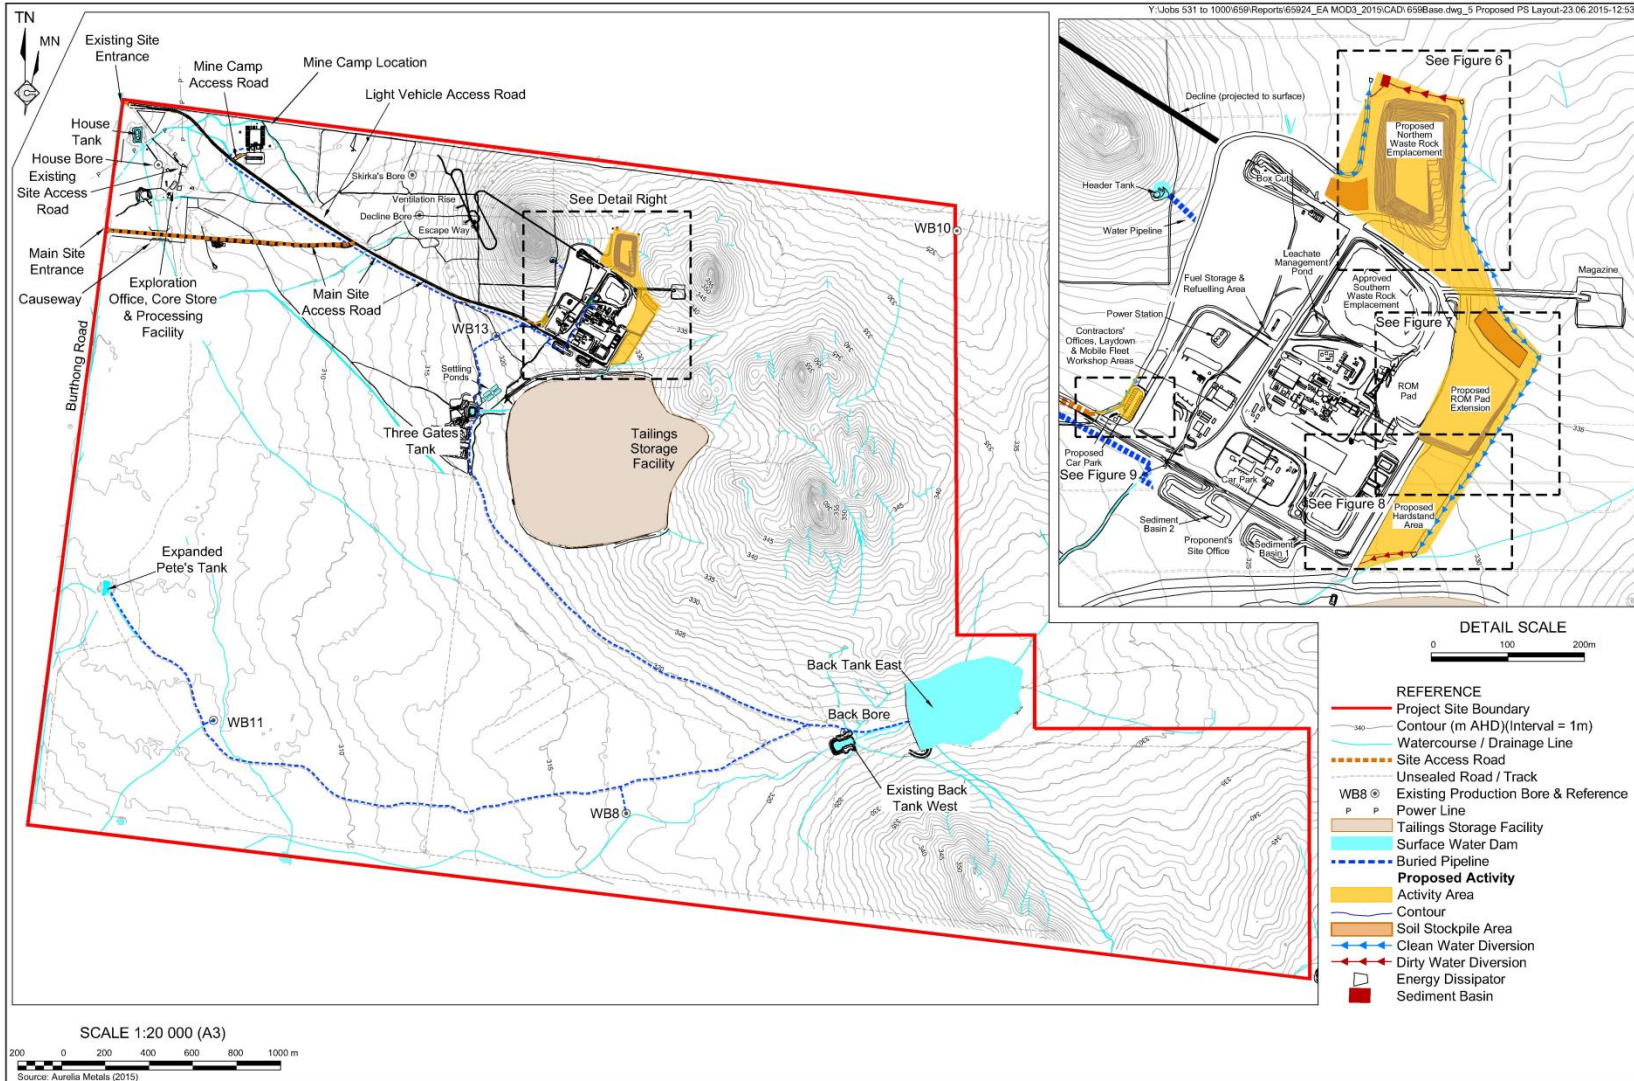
Site plan showing the approved layout (PA 10\_0191) of the Mine.
